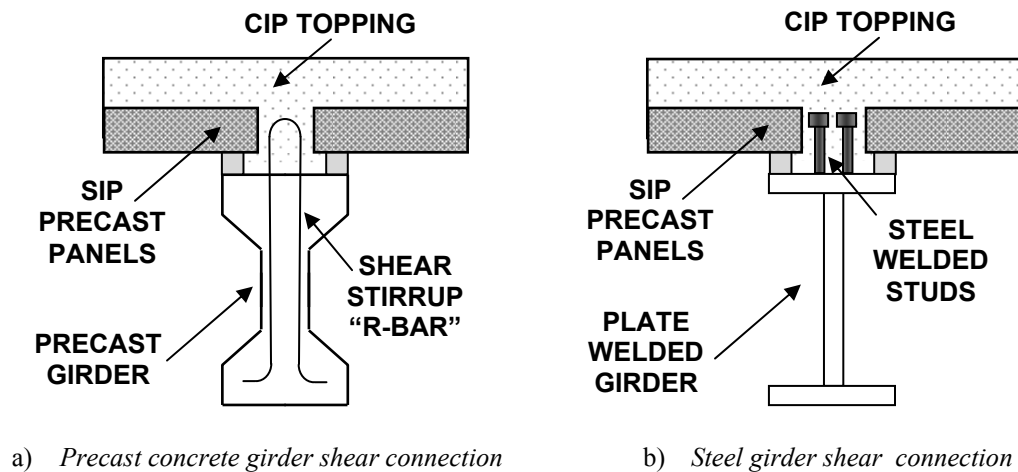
Shear connections used for CIP and SIP panel bridge deck construction
